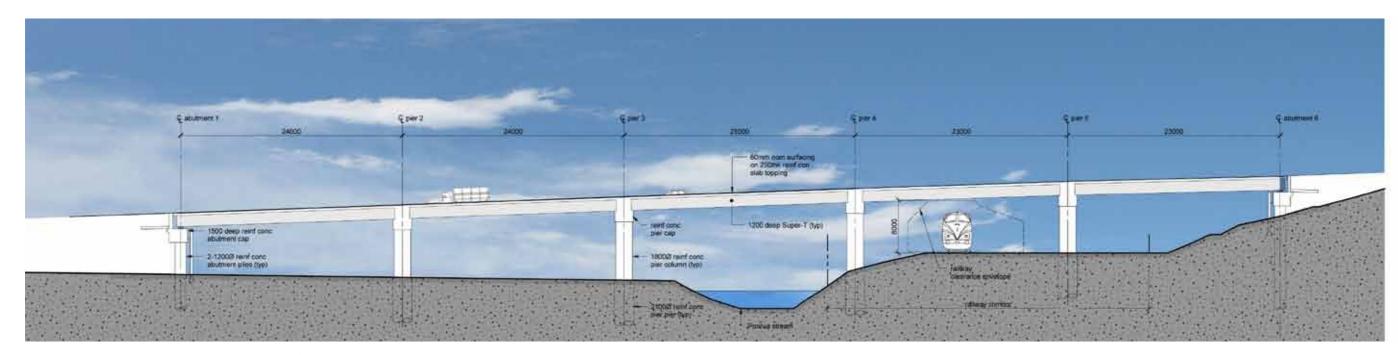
Bridge 28 Kenepuru Link Road bridge elevation
